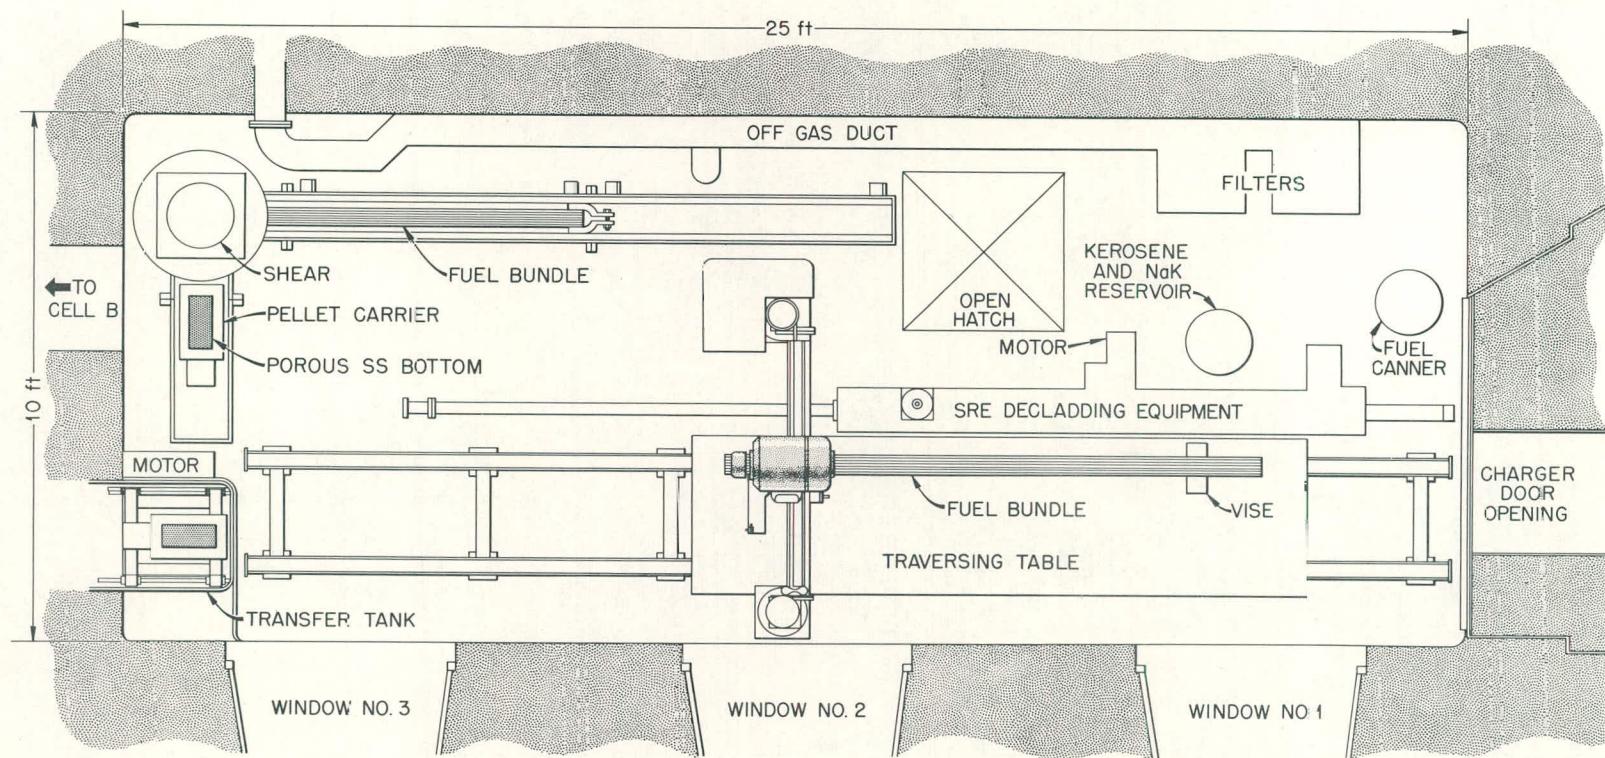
Proposed Installation in Segmenting Facility - Bldg. 3026 Plan View - Cell "A" (Dismantling and Shearing).
